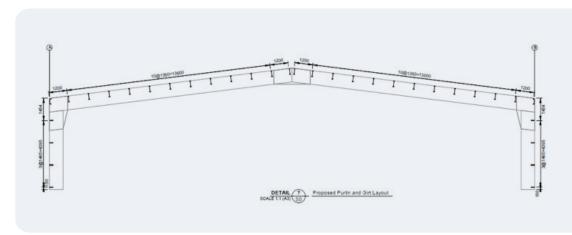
Section of Timber Portal Frame (10.0 m portal spacing shown).
